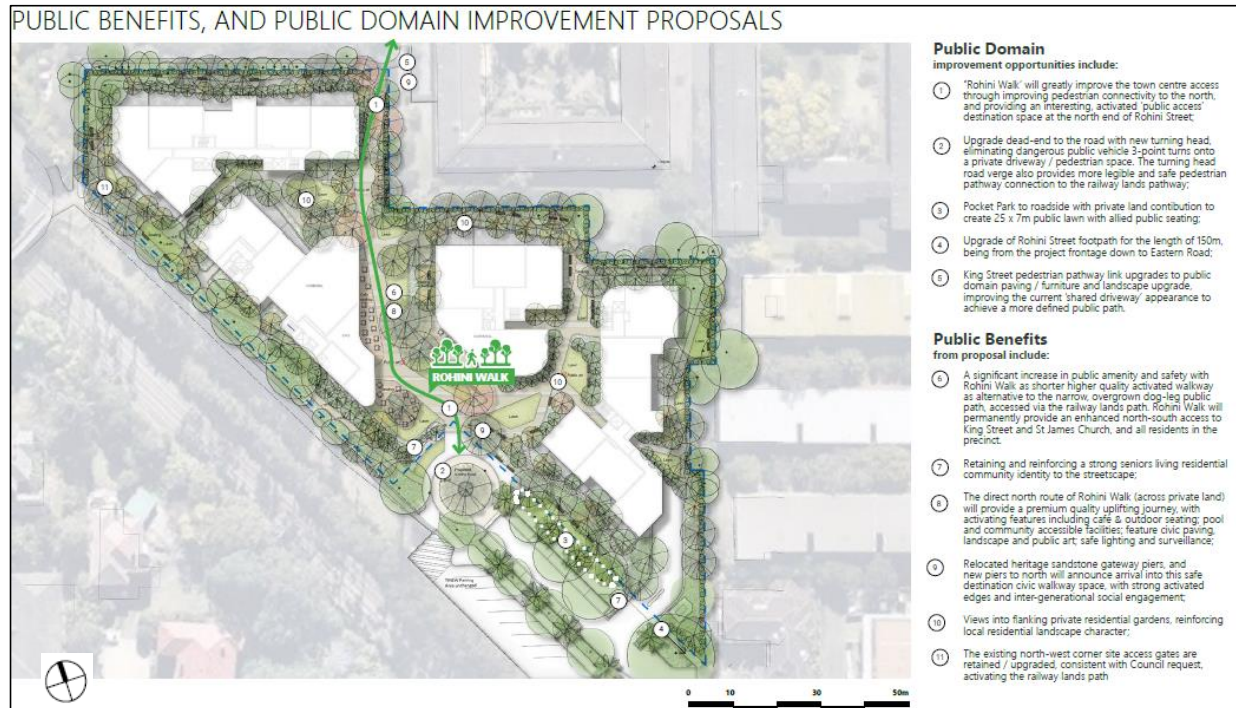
Concept Landscape Masterplan with potential Public Domain upgrades
